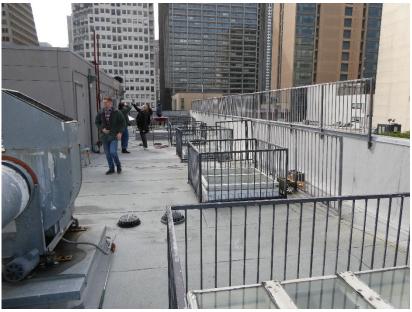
Roof, looking south. Skylight and protective railing at foreground, mechanical penthouse at background, left. (Photo taken by P&T 03/14/2025)
